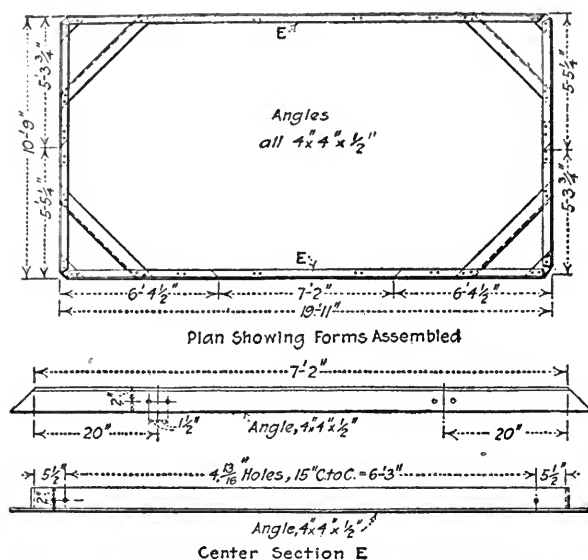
STEEL FRAME USED FOR STIFFENING FORMS.
